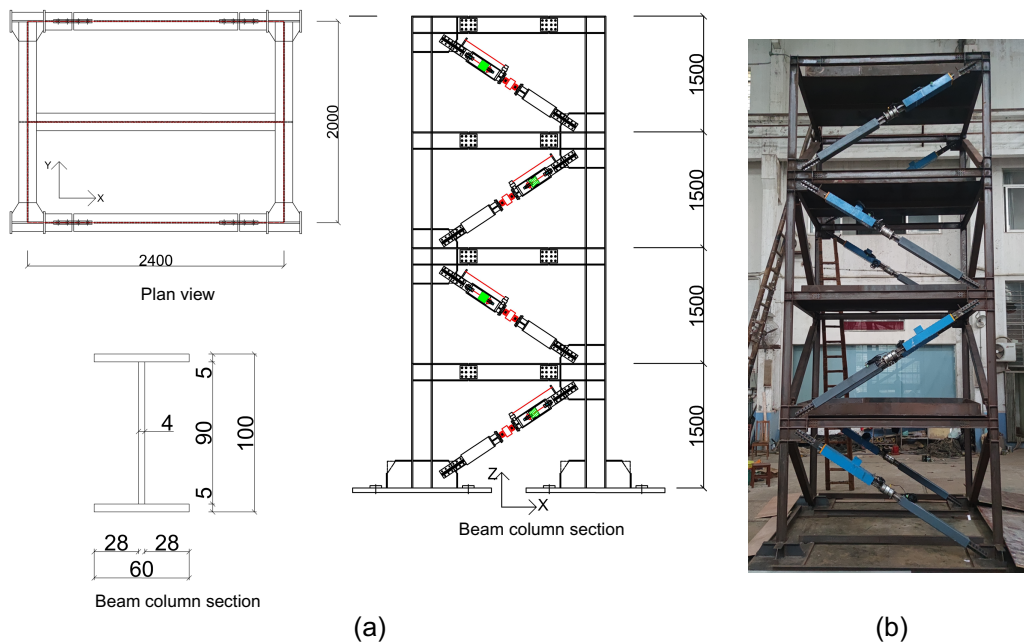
(a) Schematic drawing, and (b) actual photo of the SMA braced steel frame specimen
